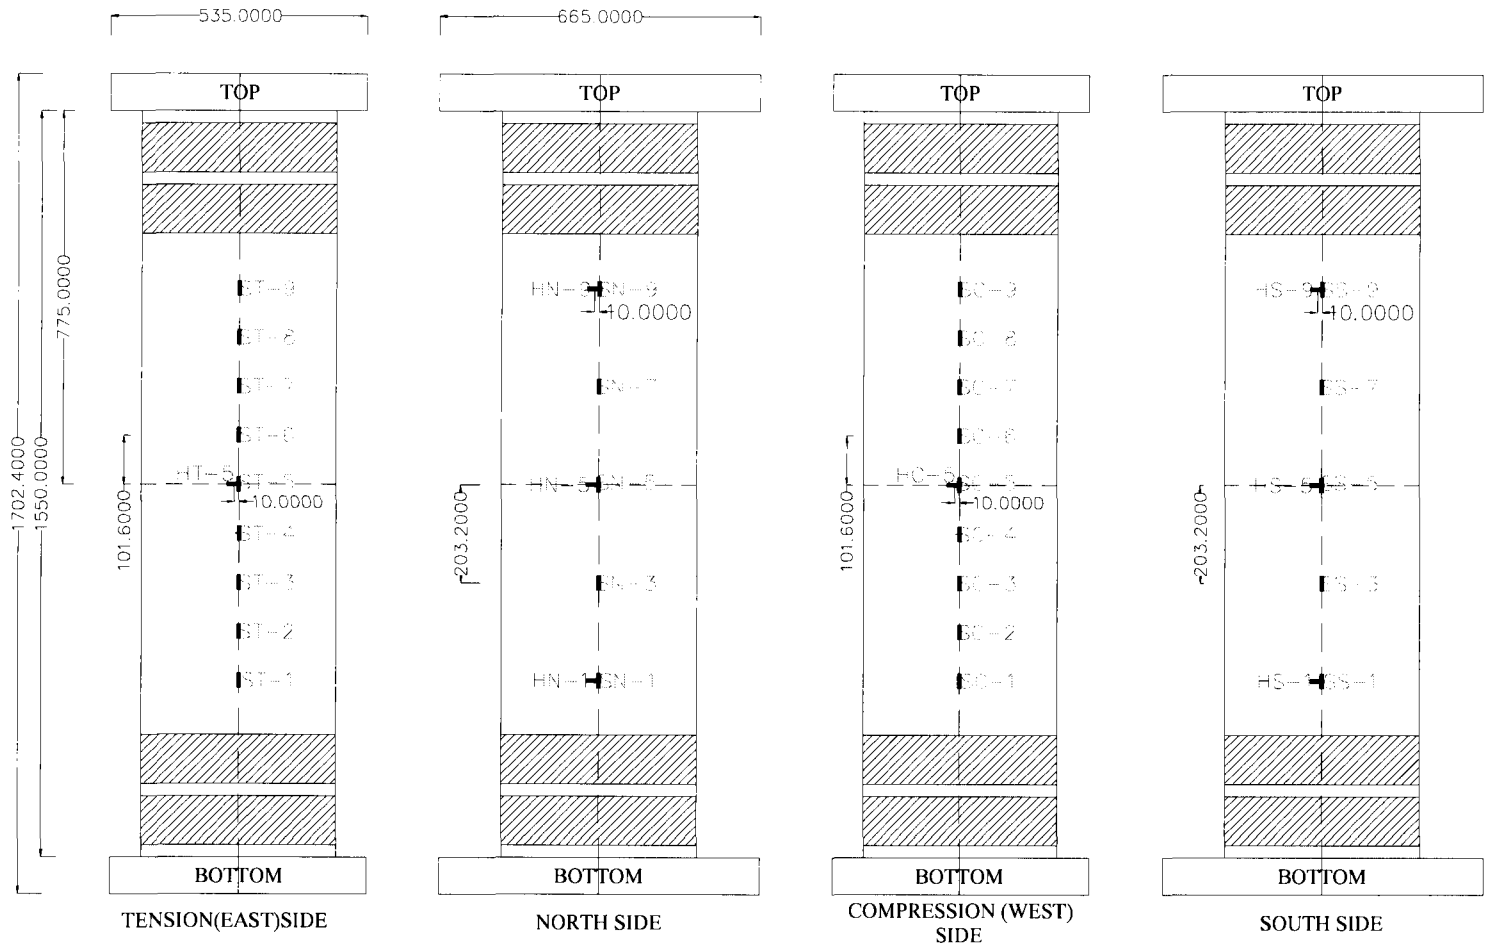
Strain Gauge Layout for 16 inch Pipes - Initial
